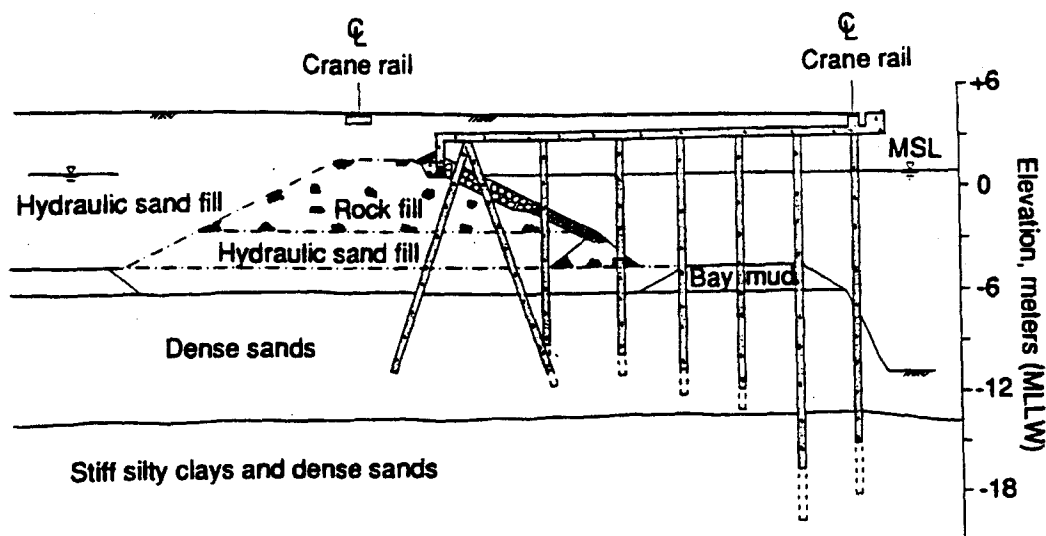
Typical cross section of the Seventh Street Terminal wharf (Egan et al., 1992)
